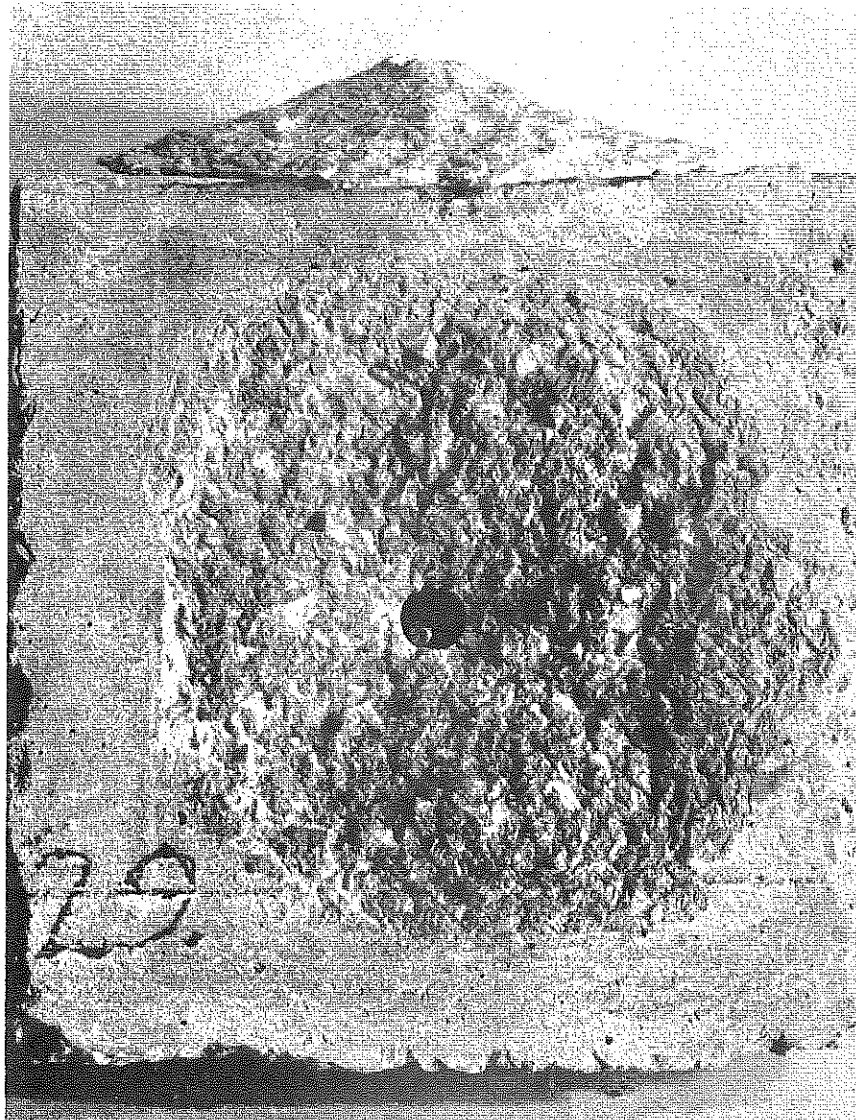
Photograph of Test Specimen Showing Pop-Out.
